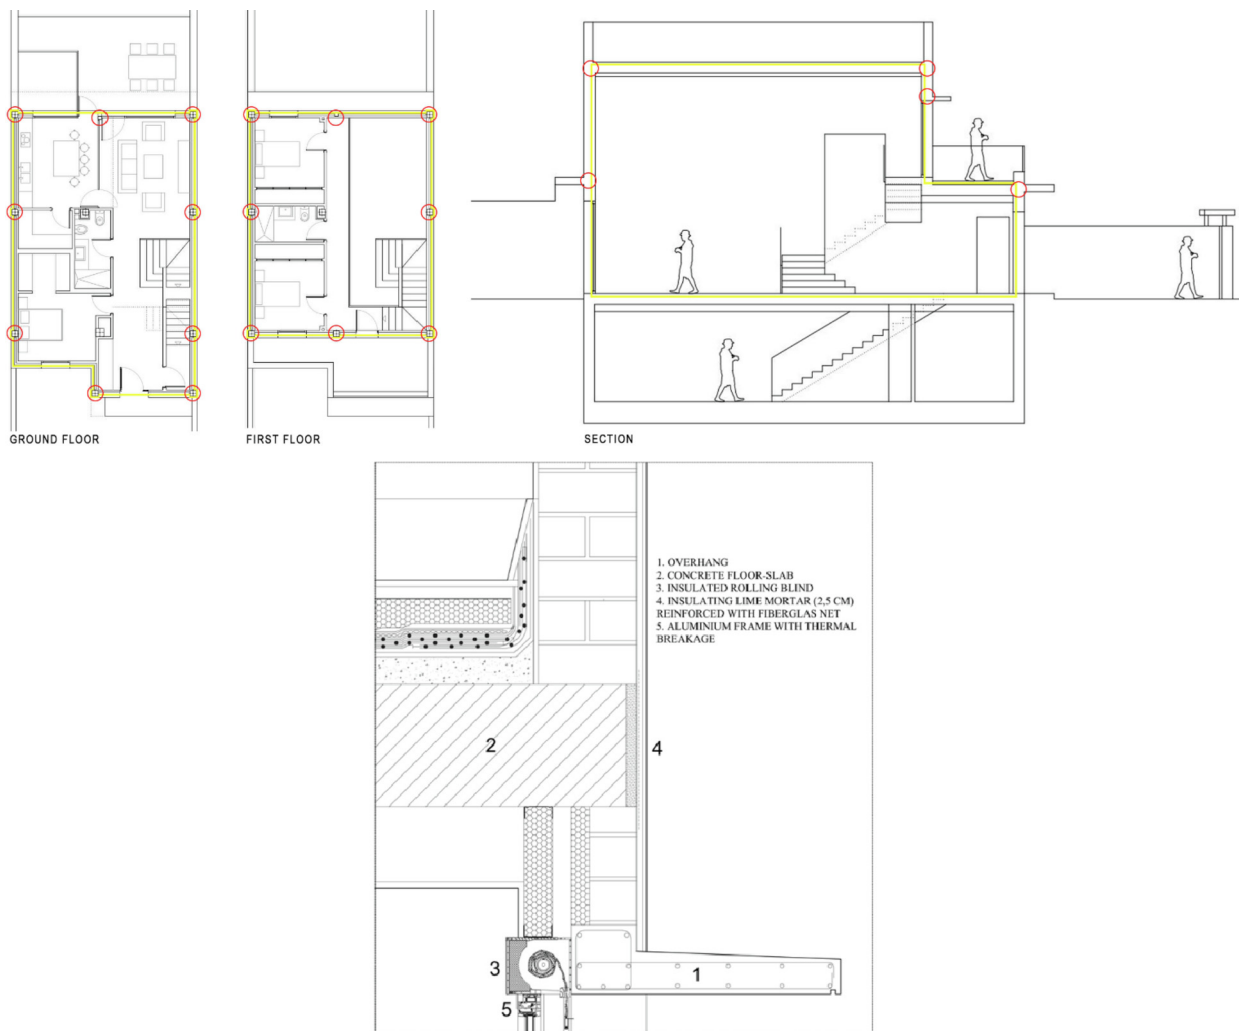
a) Insulation continuity in the envelope to avoid thermal bridges. Circles represent the presence of thermal bridges. b) Constructive detail solving thermal bridges of structure and openings. Solar shading systems in openings (overhang and rolling blind). Source: the authors.
